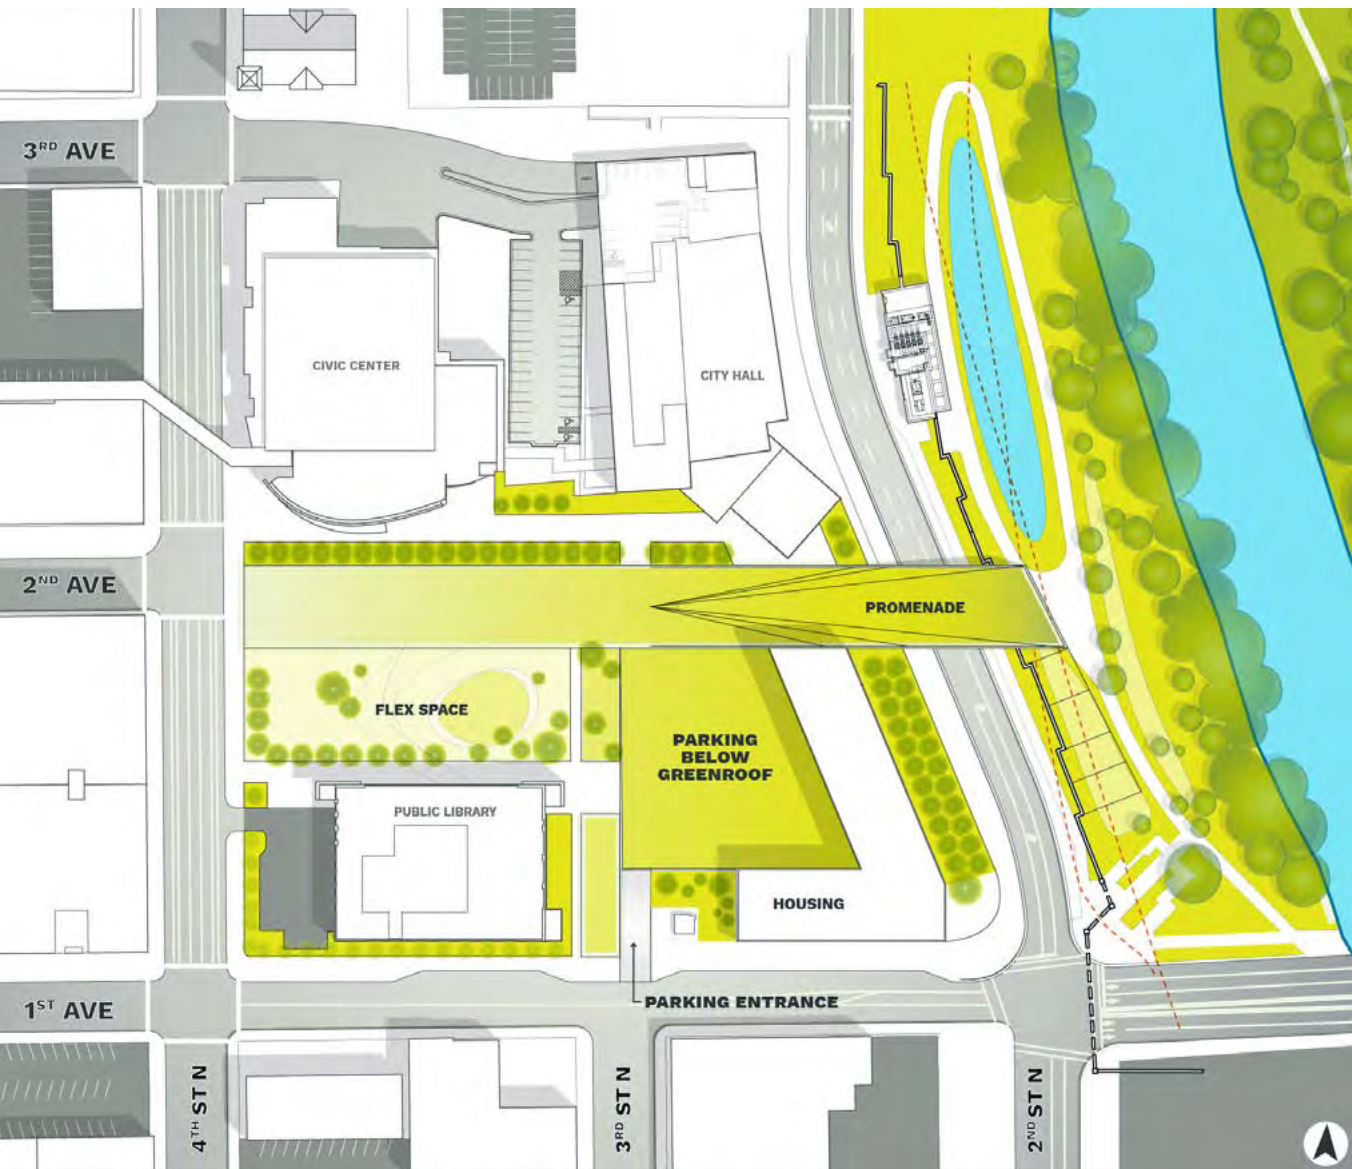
Conceptual Site Plan Alternative with Cantilevered Promenade connecting City Hall Plaza with Riverfront
